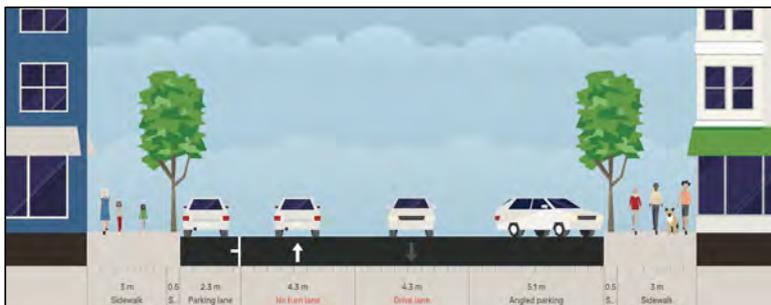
Existing Main Street cross section (between John Street and pedestrian crossing)
